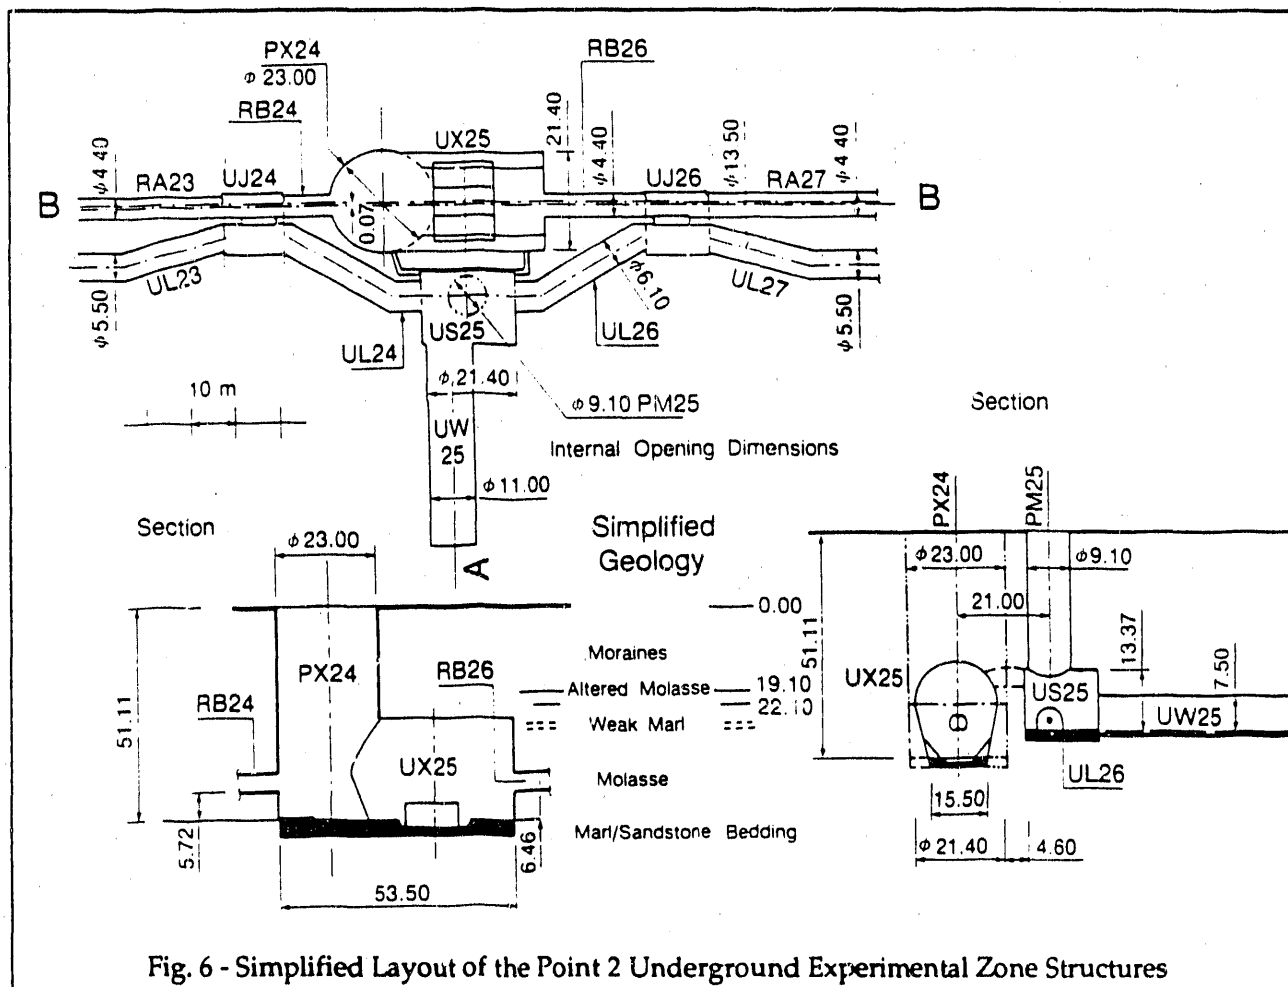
Simplified Layout of the Point 2 Underground Experimental Zone Structures
